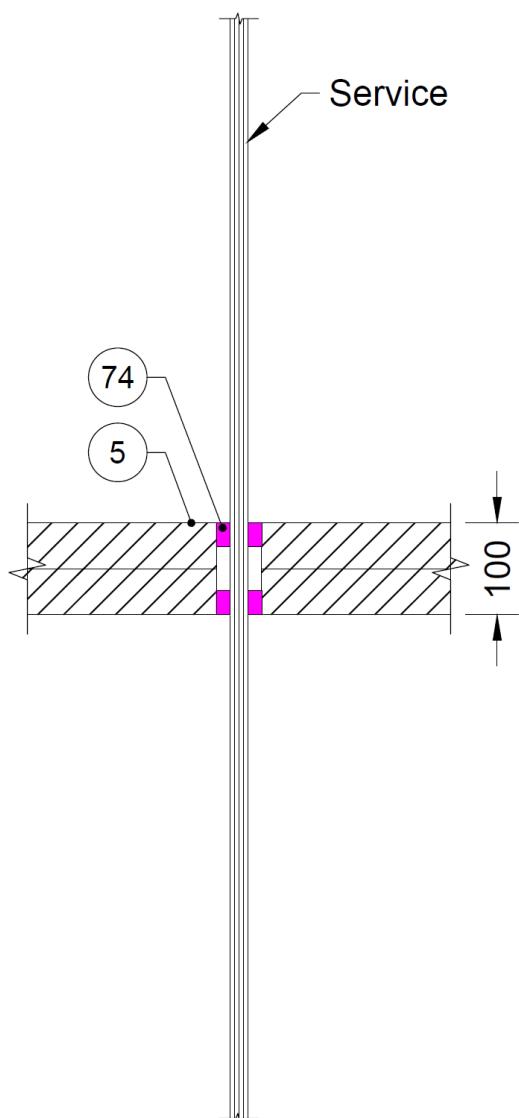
Section View of Pipe conduit with cables Installed in Horizontal Substrates
